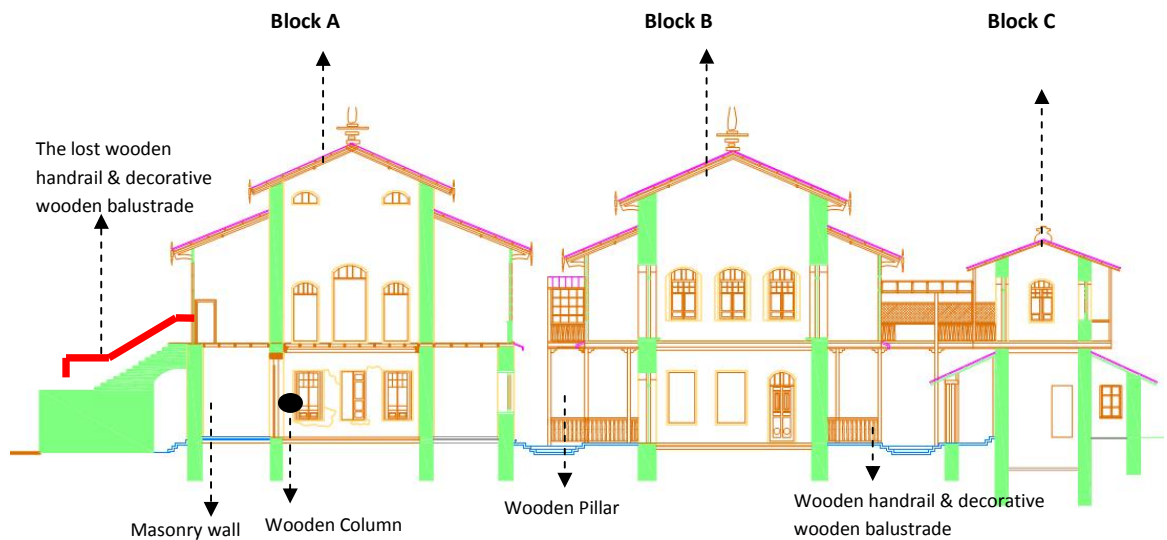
section drawing of the Palace building (Drawn by –Rahel lemma August 2017)
